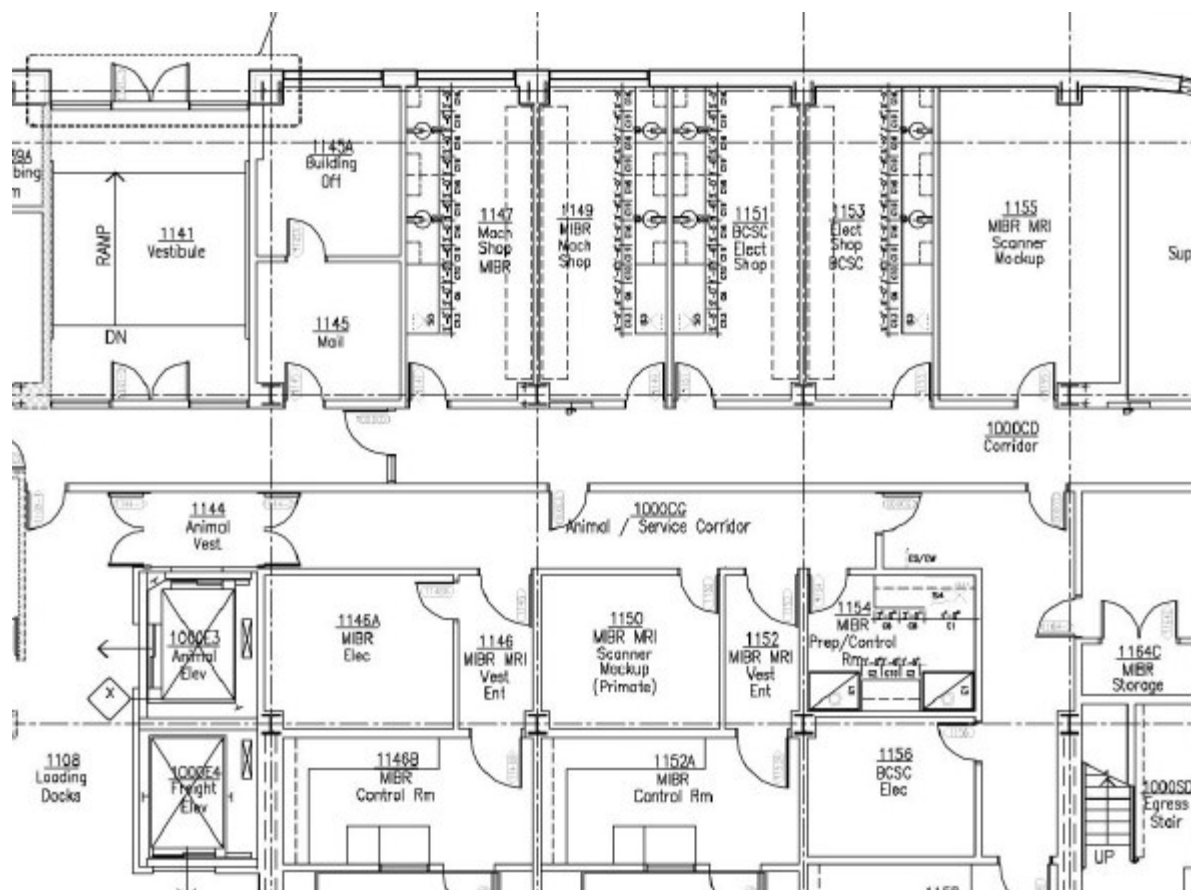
Building 46, 1st Level, Room 1145-1153 Layout
